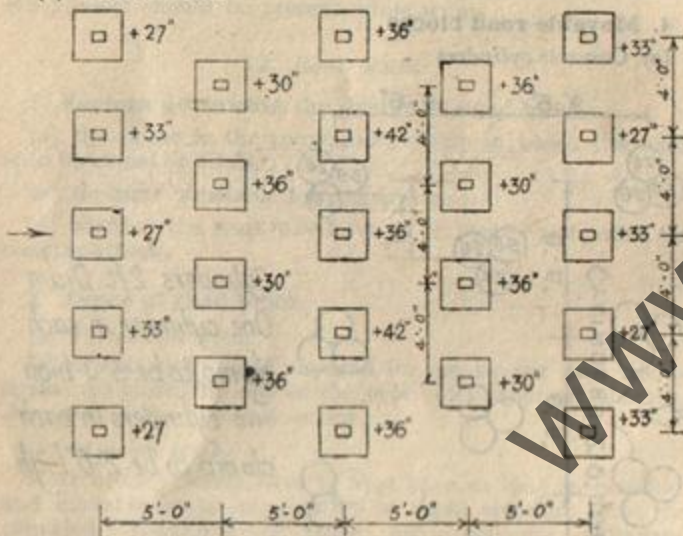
LAYOUT OF VERTICAL RAIL OBSTACLE FOR 20-FT ROAD
